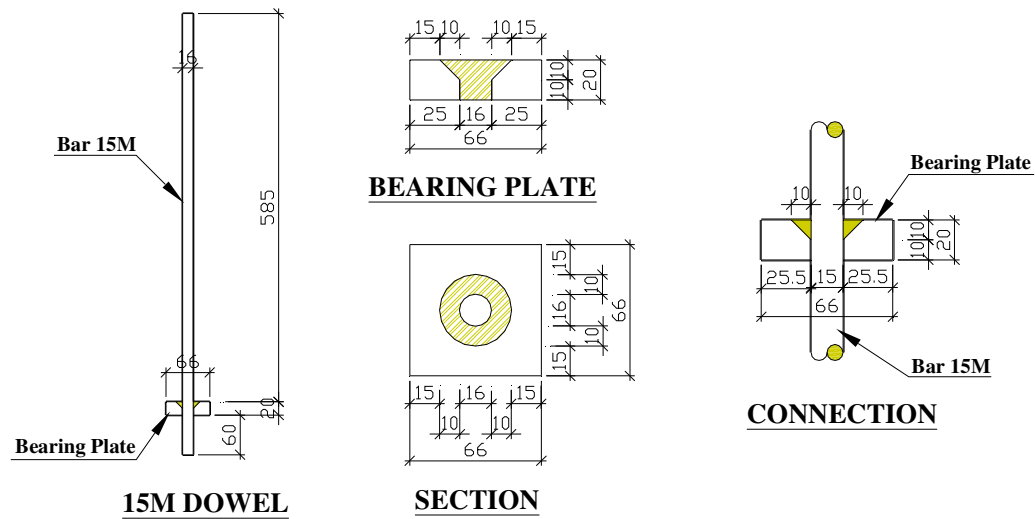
Details of the dowel and bearing plate (dimensions in mm).
